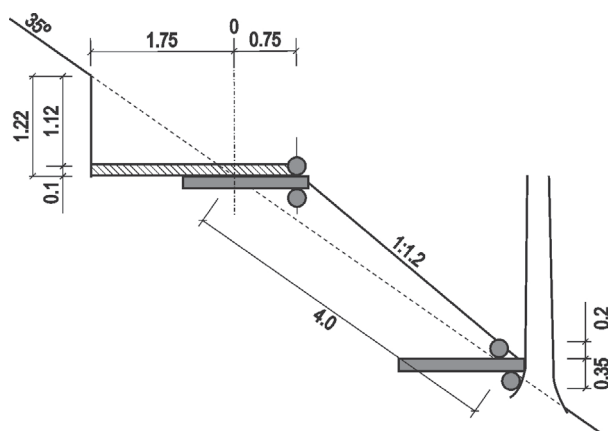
Structure of retaining wall with log structure (Original: Oohashi 2001)
